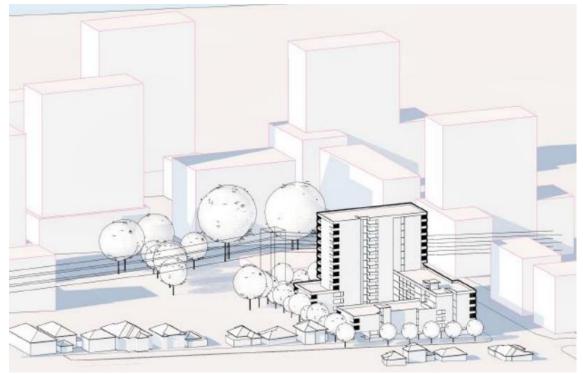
Planning proposal built form outcome - west perspective (Source: Planning Proposal Report)
